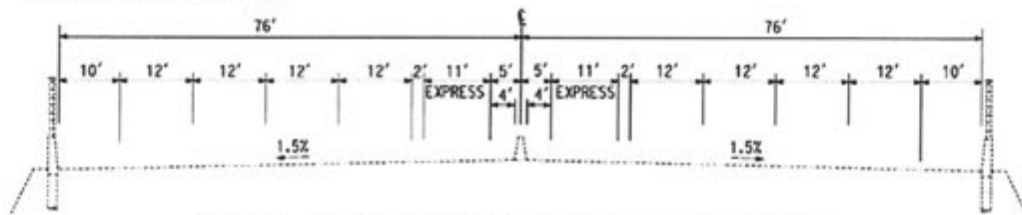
Proposed I-10 Cross Section in Tangent Sections
